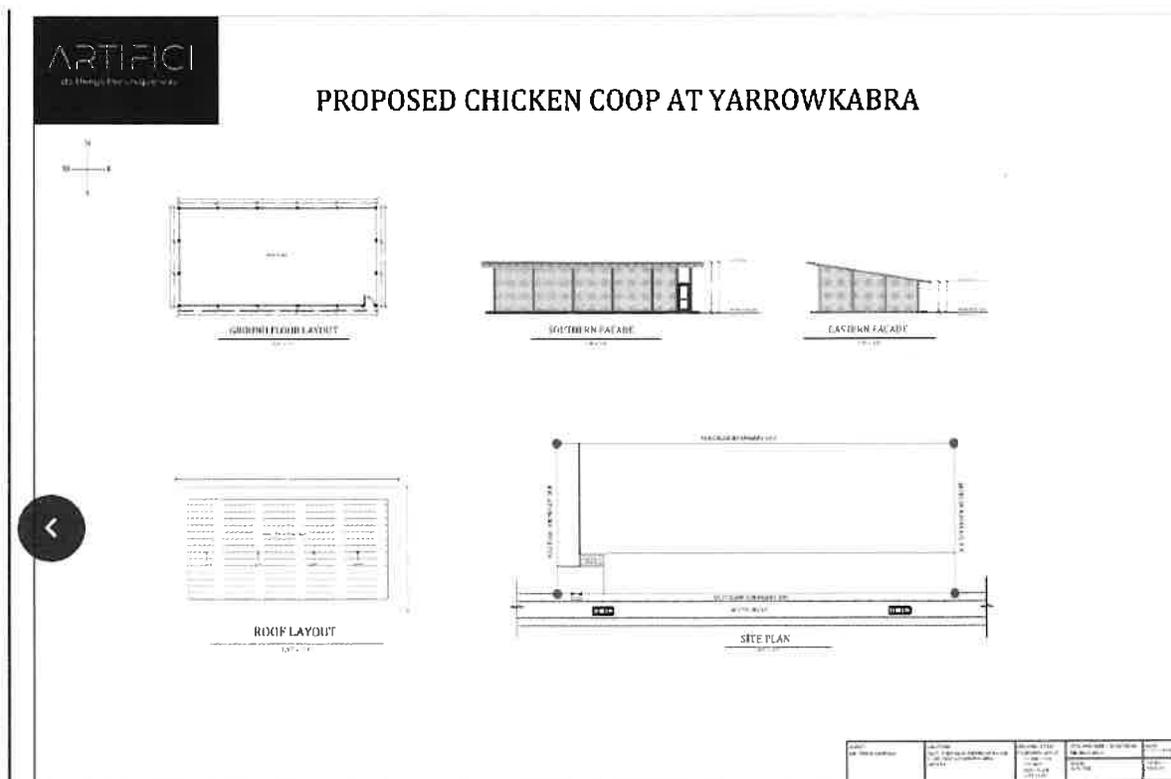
Site plan along with proposed design and dimensions for the first chicken pen.
